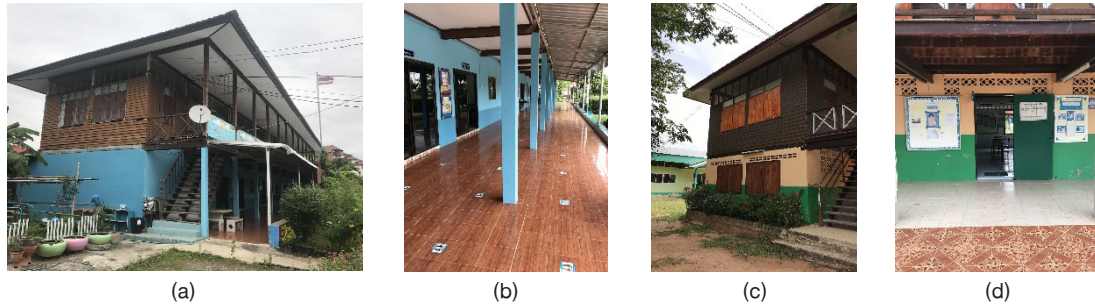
Extensions to Type A building: (a) additional roof structure; (b) added office space; (c) a new additional classroom and (d) extension of space in front of the building with new tiled floor.
